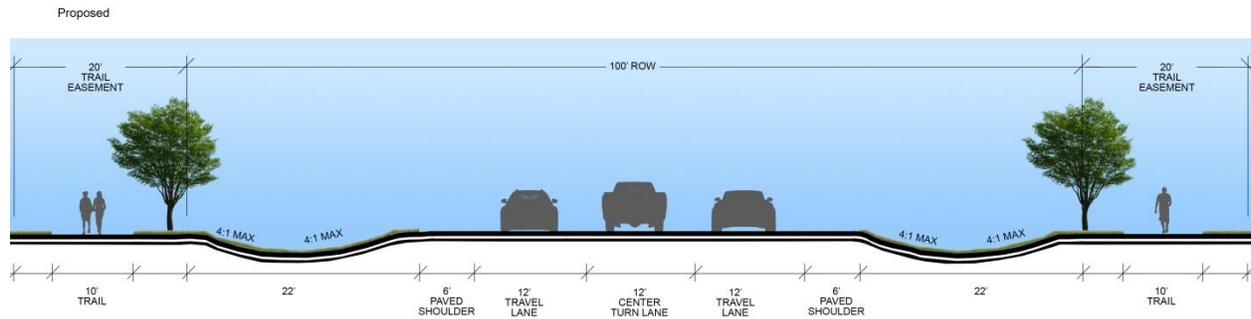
Typical Section of Rural Minor Arterial Roadways
